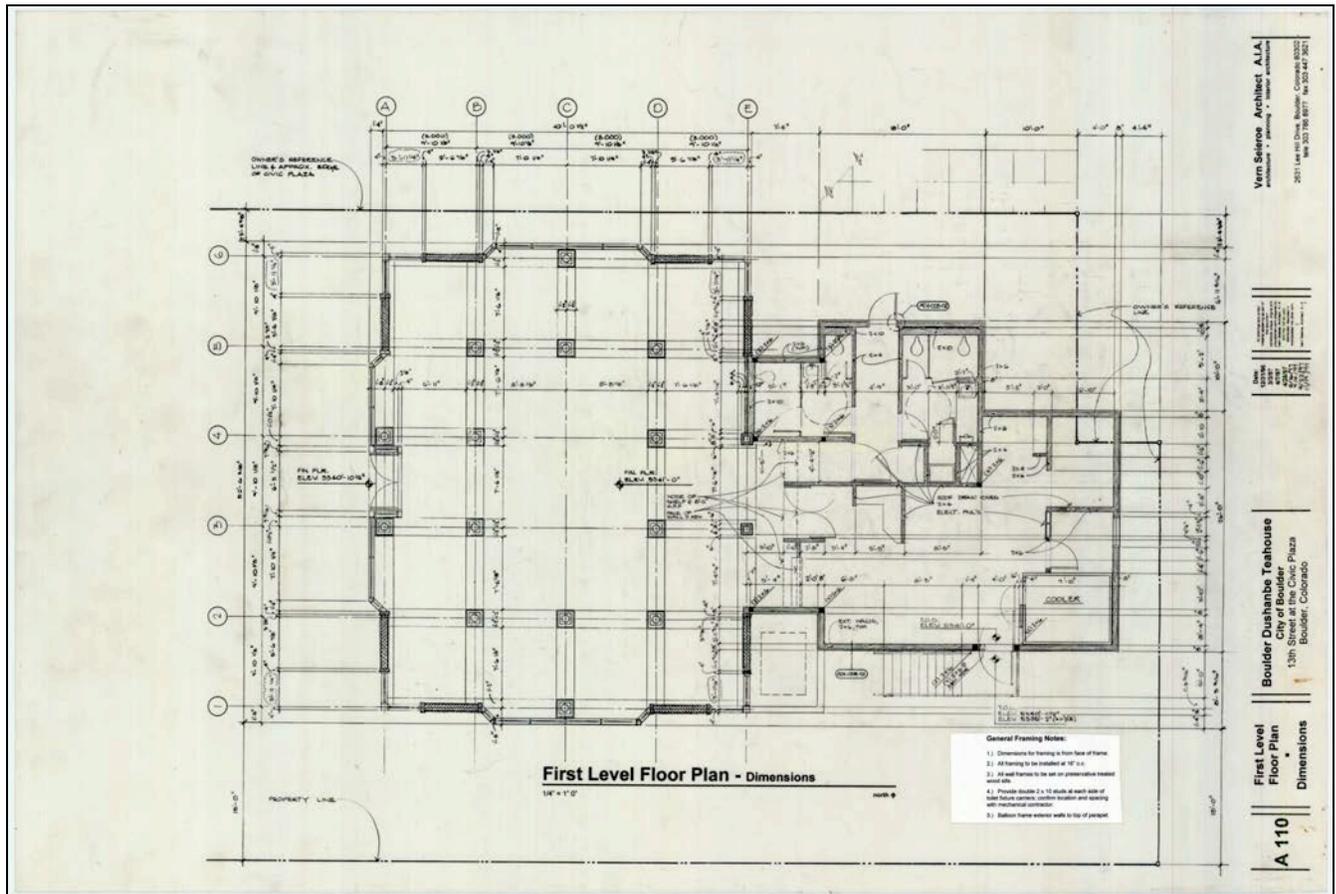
Construction Drawing A110, First Level Floor Plan, Vern Seieroe, AIA, Architect (north is up on drawing)
